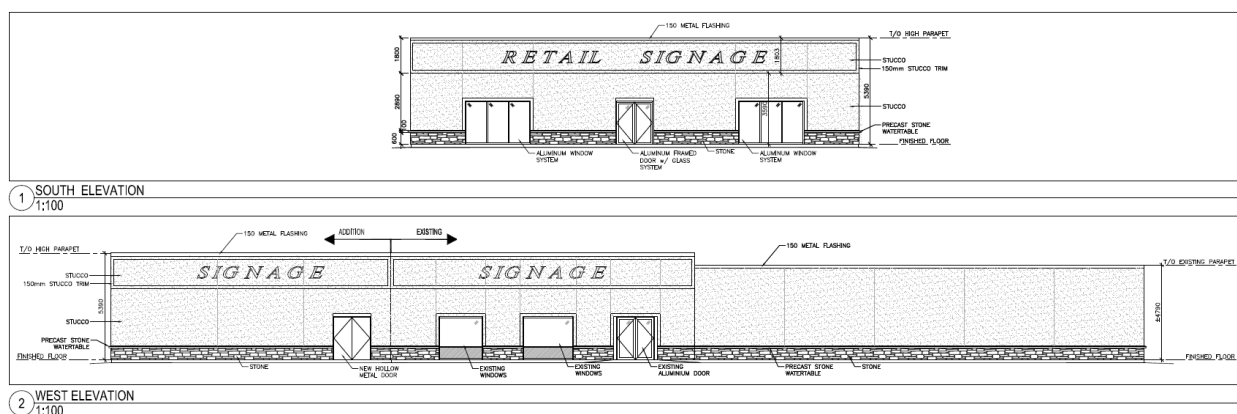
South (front) and west elevations of the proposed building addition at 685 Fanshawe Park Road West
